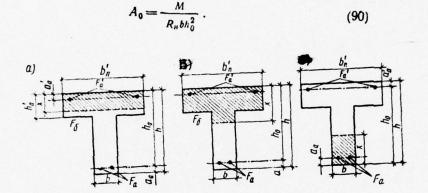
Scheme of the disposition of the compressed zone of concrete in a reinforced concrete slab of a T transverse cross section (with a calculation for stability): a - neutral axis passes into the flange of the beam (compressed zone—part of the beam); b-neutral axis passes into the rib (compressed zone—flange of the beam and part of the rib); c- neutral axis passes into the rib (compressed zone—part of the rib).
